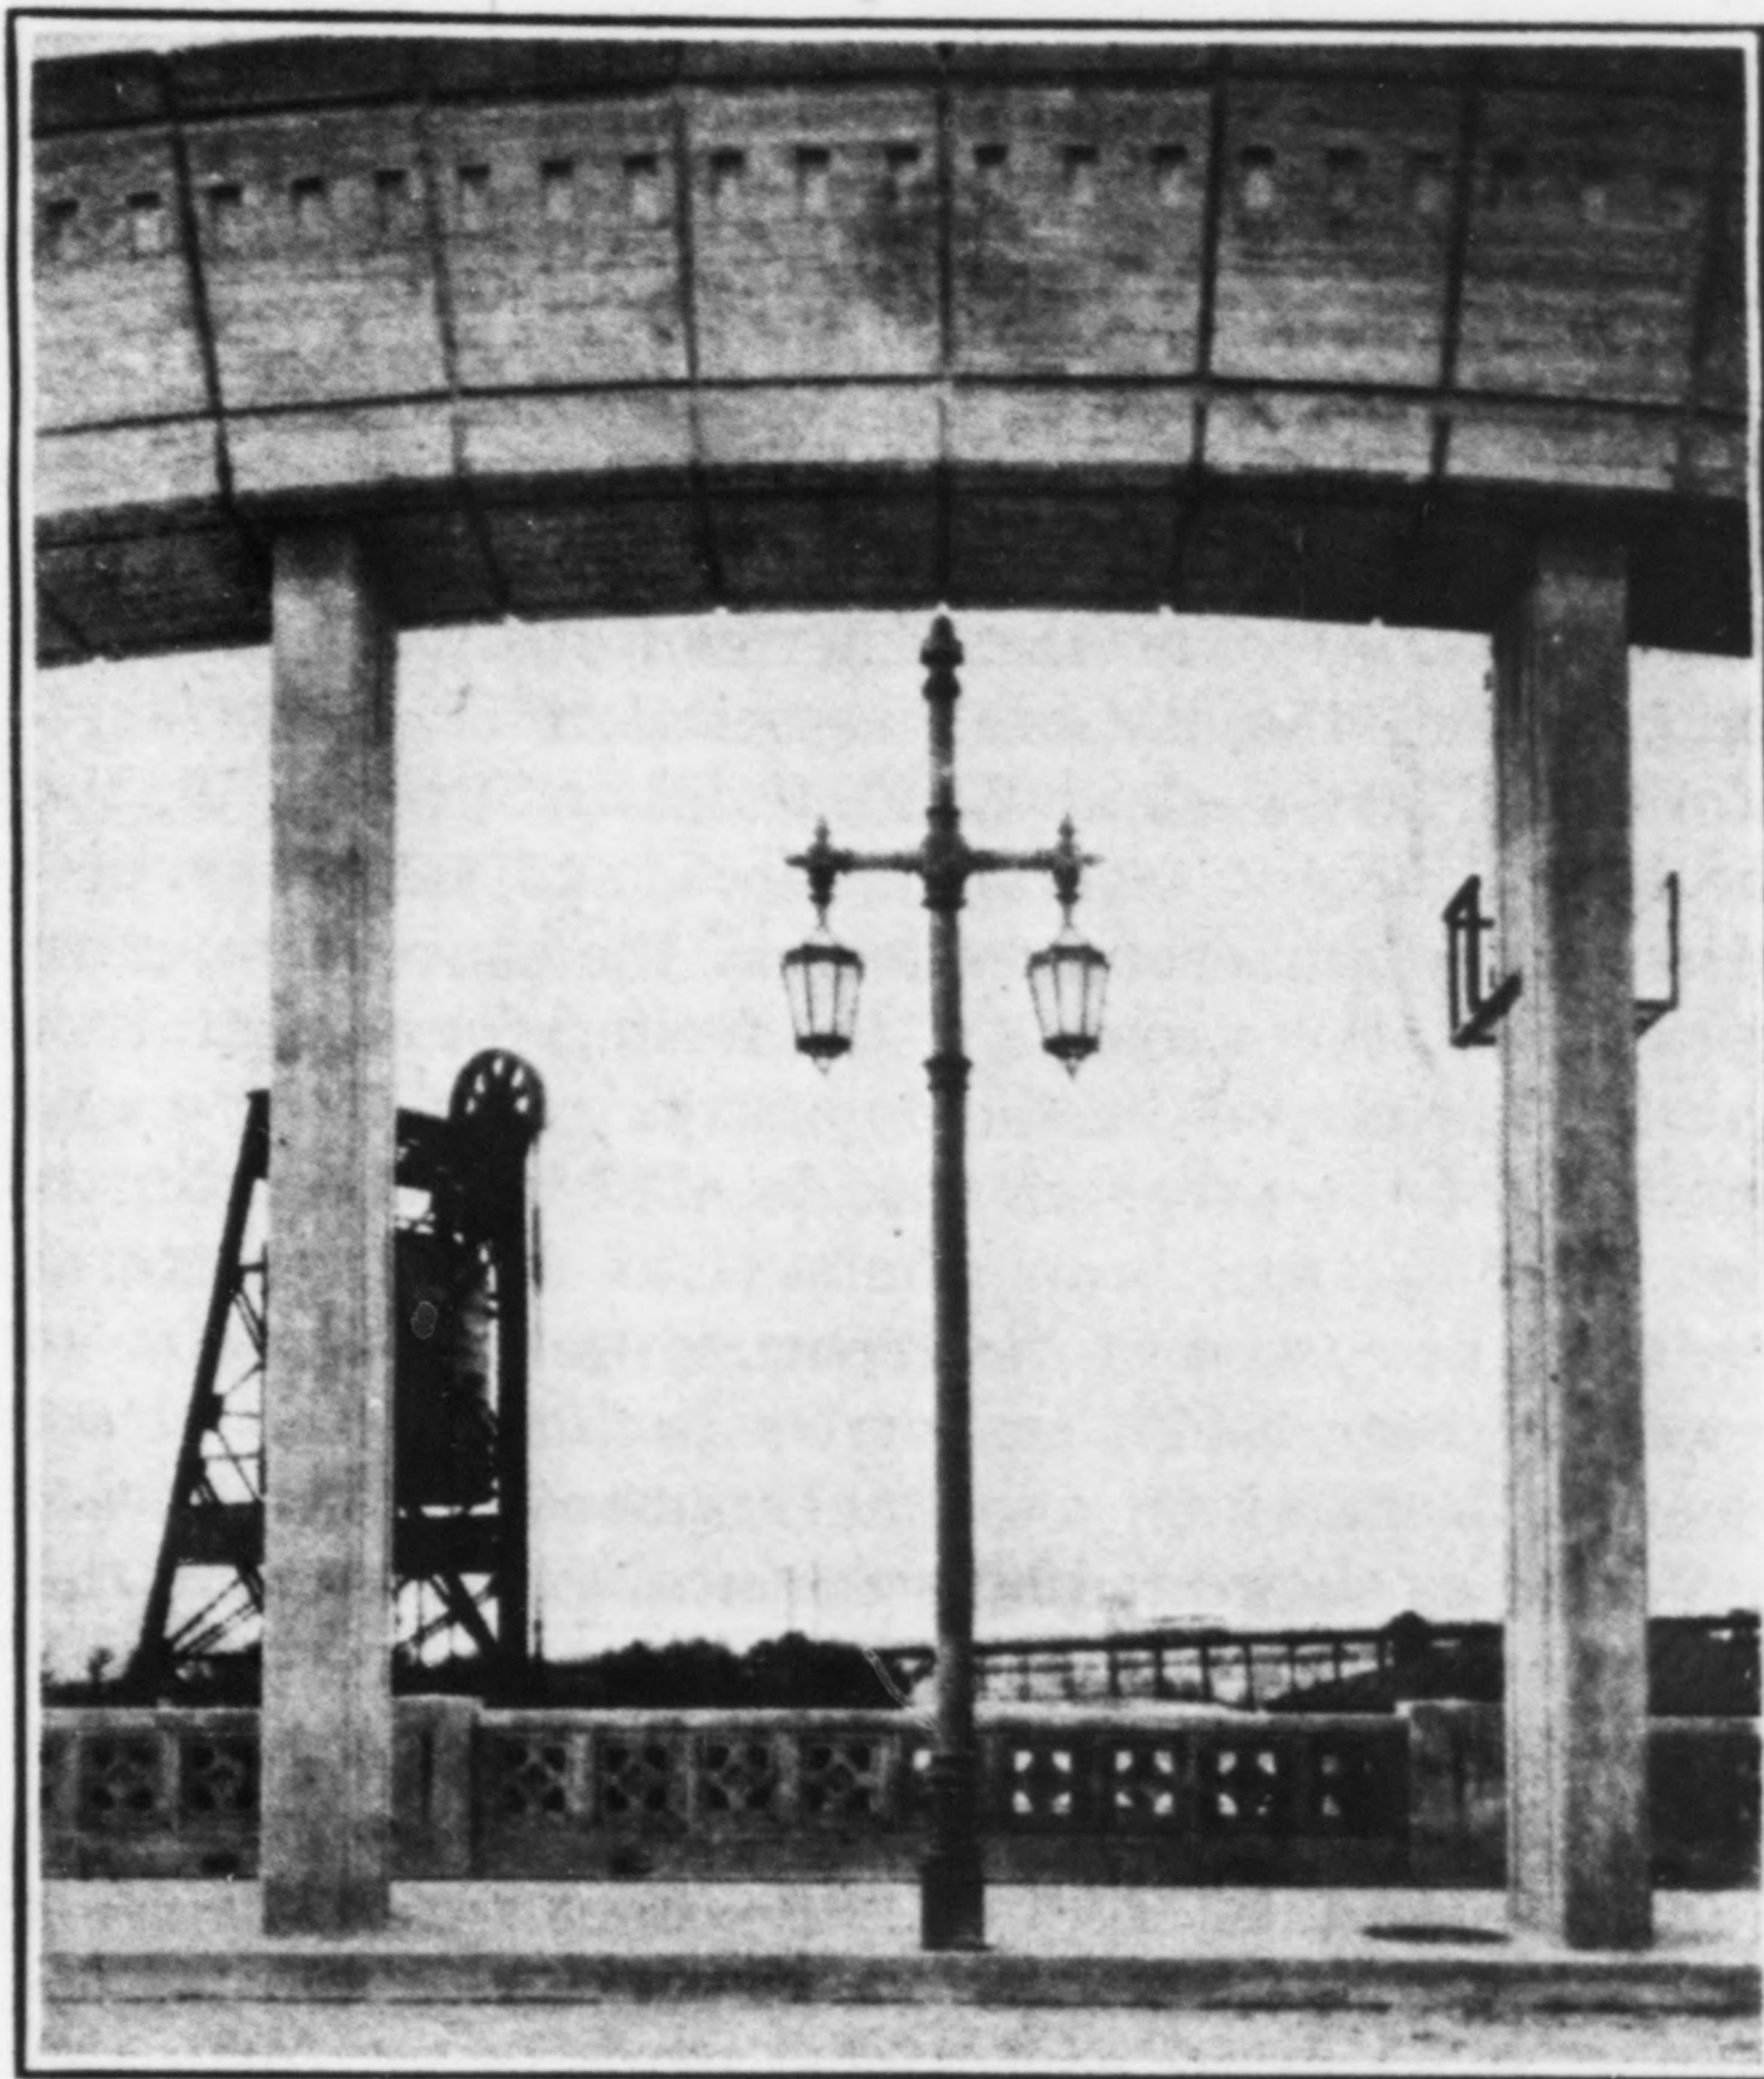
DECORATIVE TREATMENT OF ROBERT ST. BRIDGE
